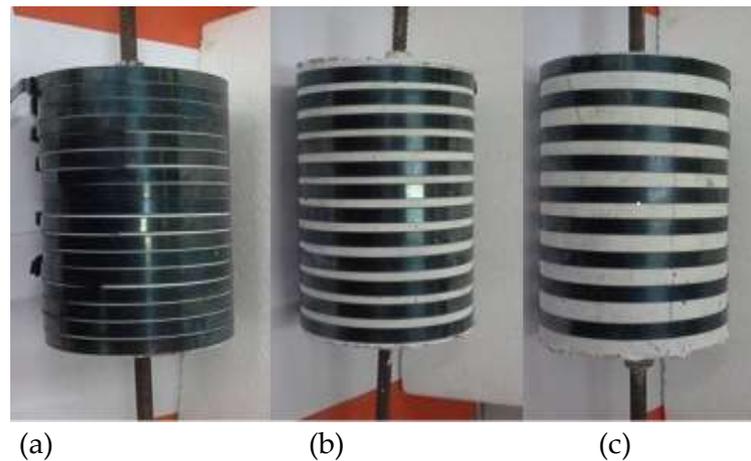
Pull-out specimens with: a) single layer steel strap with no spacing; b) single layer steel strap with 10mm spacing and c) single layer steel strap with 20mm spacing
